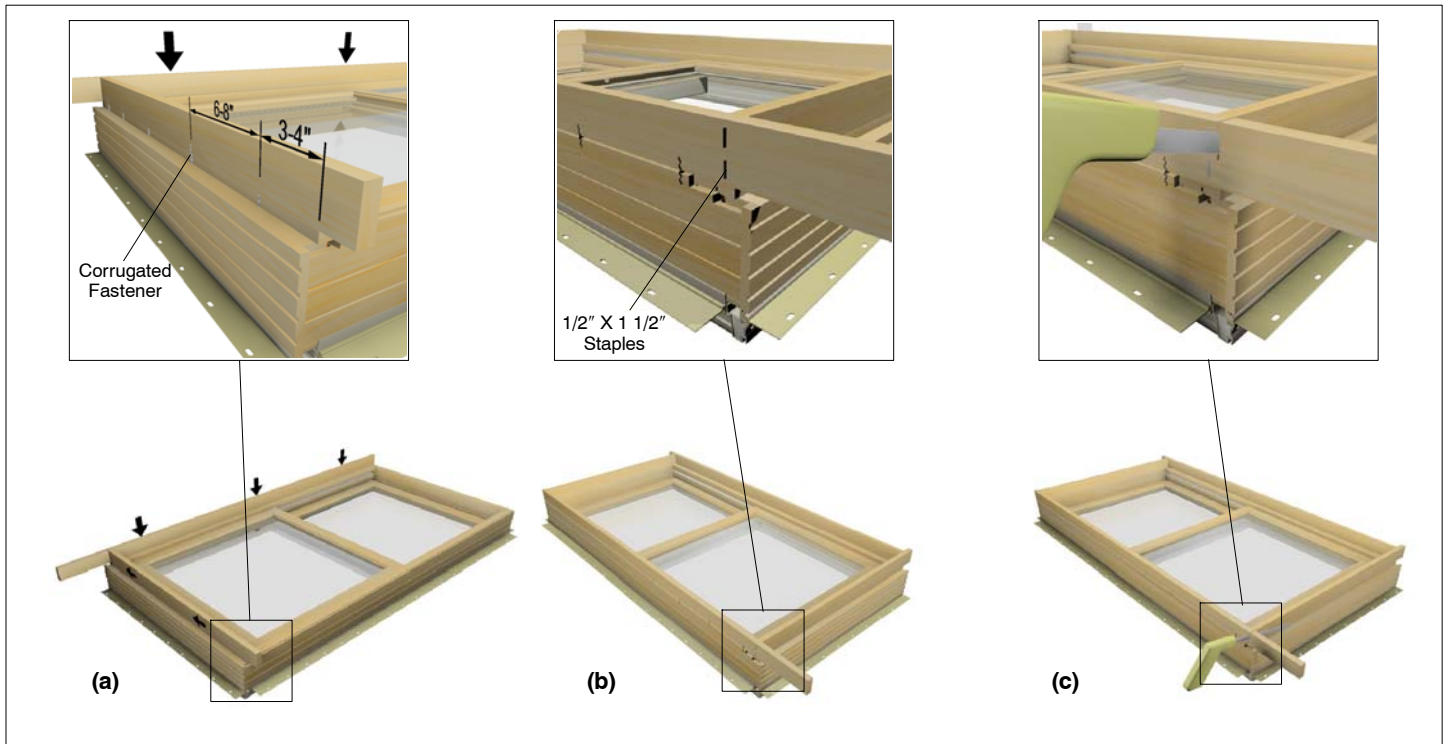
Installing Flat Jamb Extension (corrugated fasteners shown)
